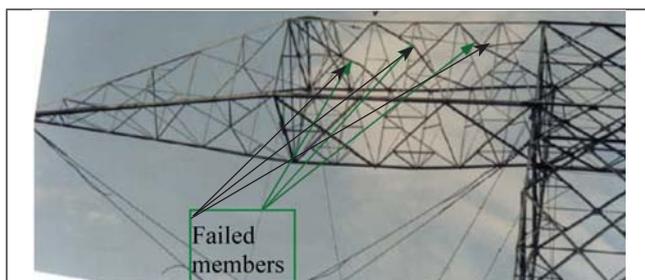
CROSSARM (N TYPE) FAILURE AT TOP PLAN
